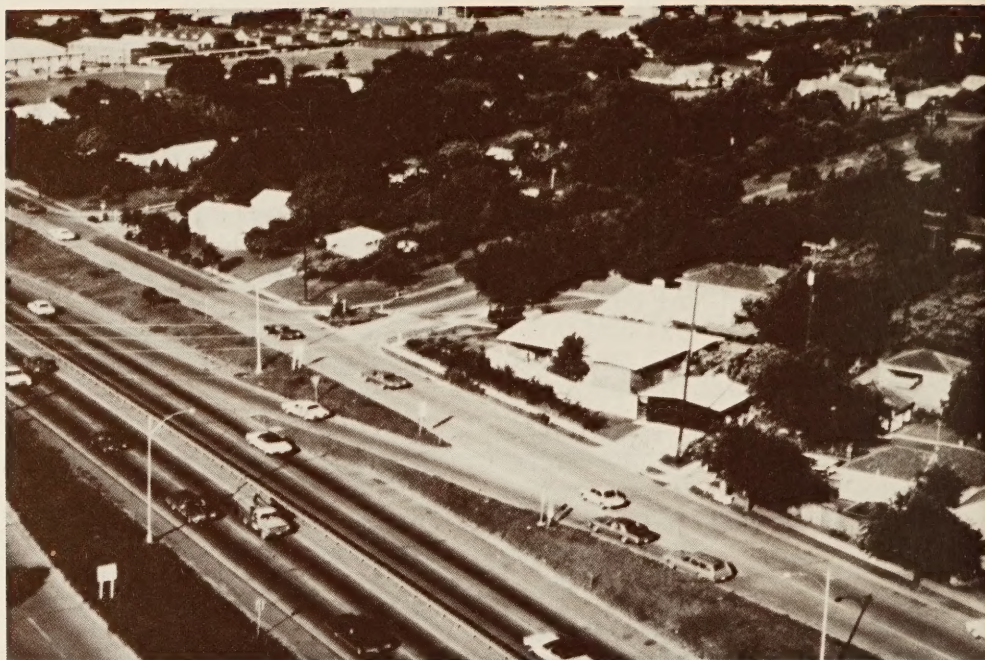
A metered onramp on the Dallas Freeway Corridor System.
